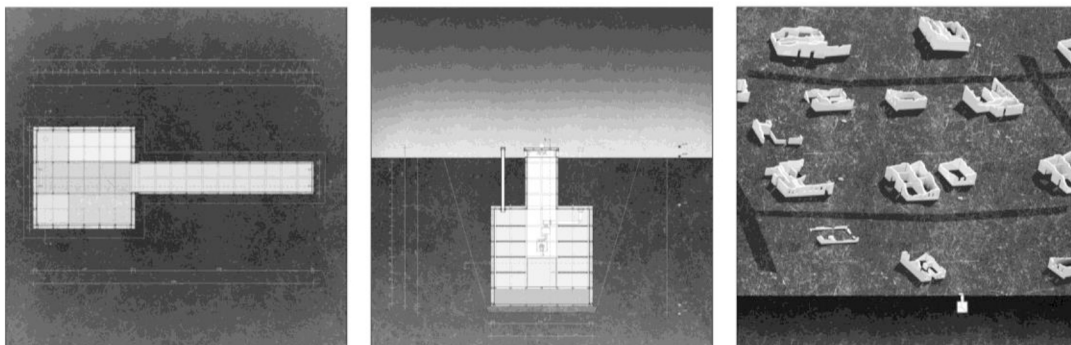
Layout, Section and 3D siteplan of the Shelter (Anna Petrovicz, Zsuzsanna Péter)
